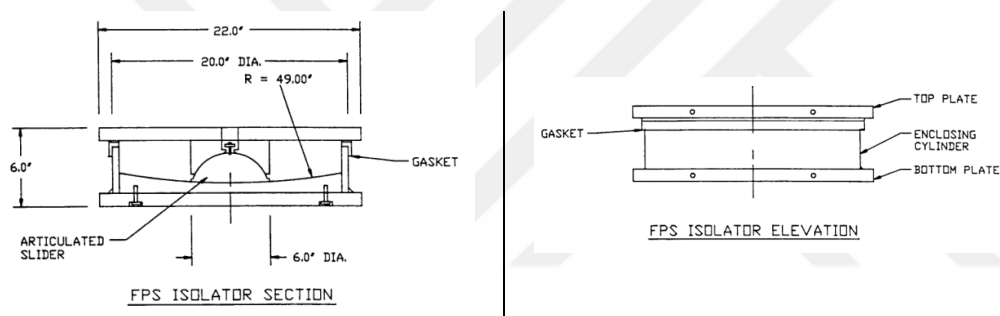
Section view and elevation view of an FPS isolator (Zayas et al., 1990)
